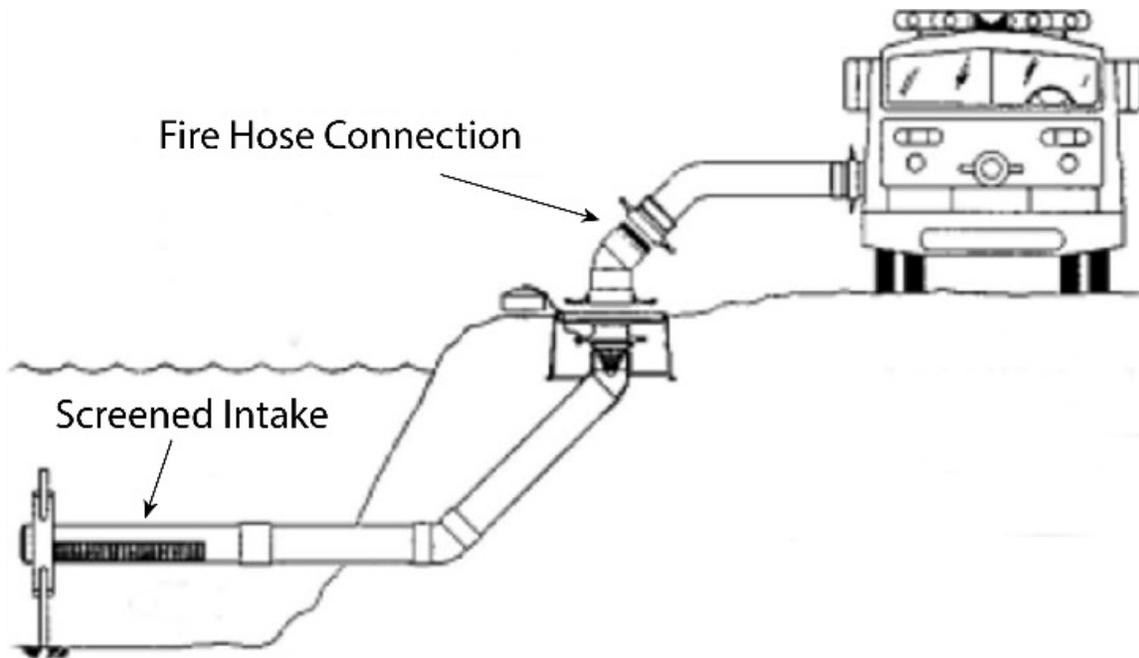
Diagram of Typical Dry Hydrant System.
